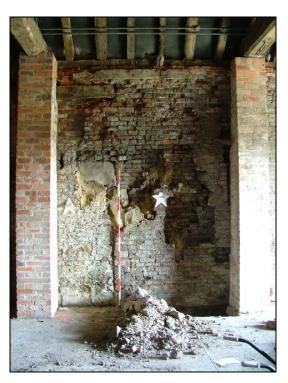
Area of brickwork removed, east internal elevation (Scale = 2m)
